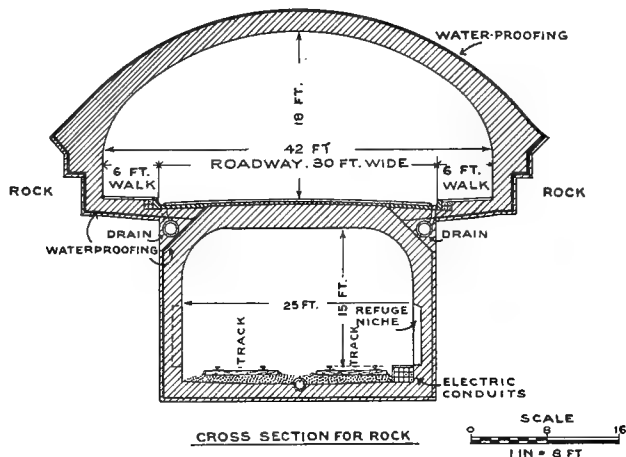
TYPICAL CROSS-SECTION OF MISSION-SUNSET TUNNEL.
